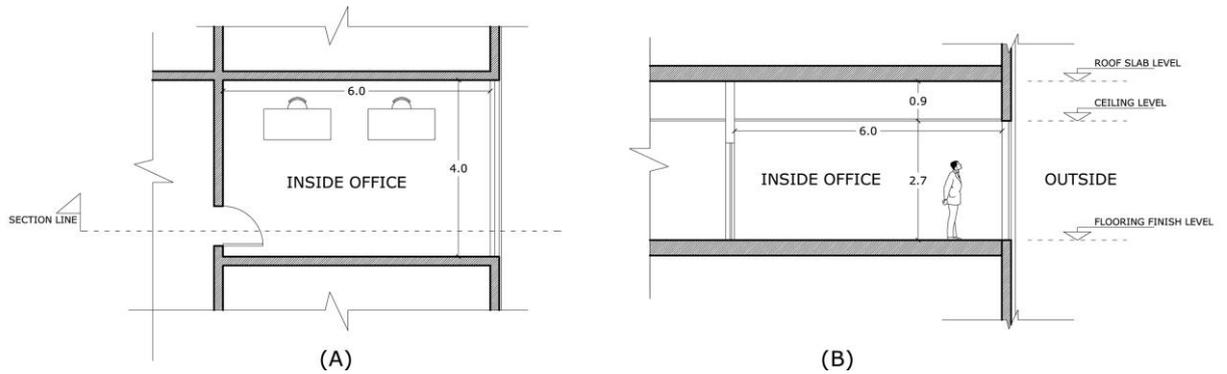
(a) typical office units plan, (b) typical office units section.
